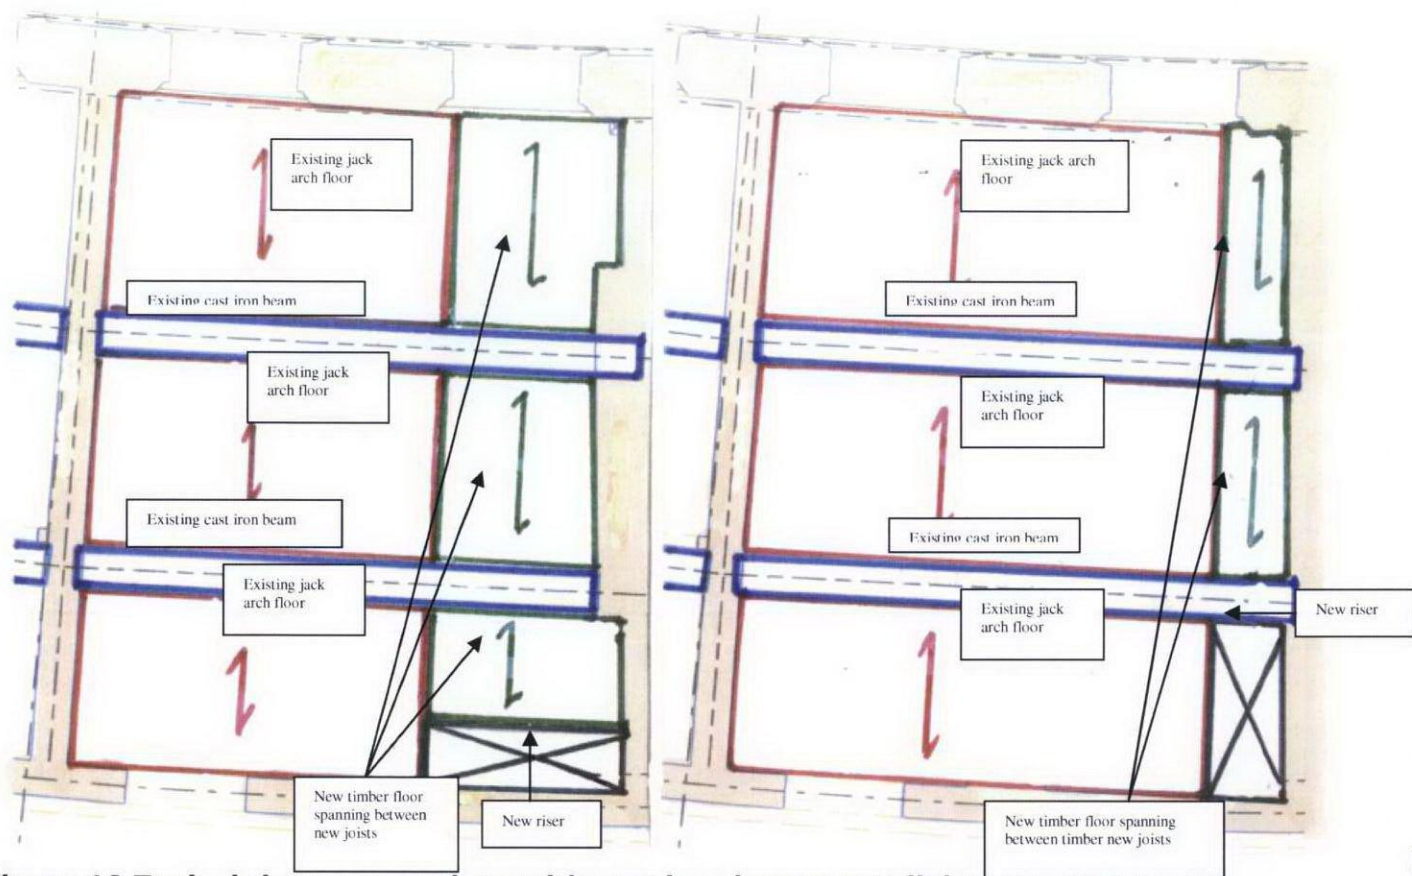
Typical riser penetrations with cast iron beams parallel to external façade
